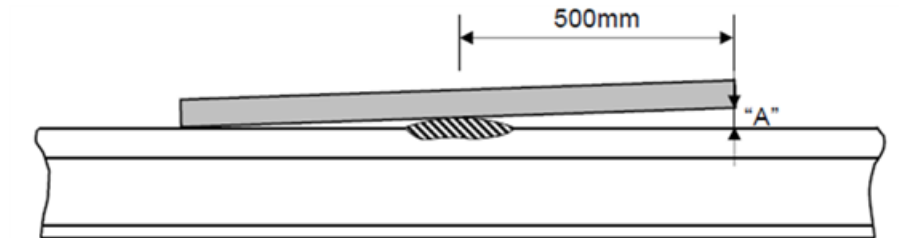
Head repair misalignment tolerance in vertical plane (peaking)
